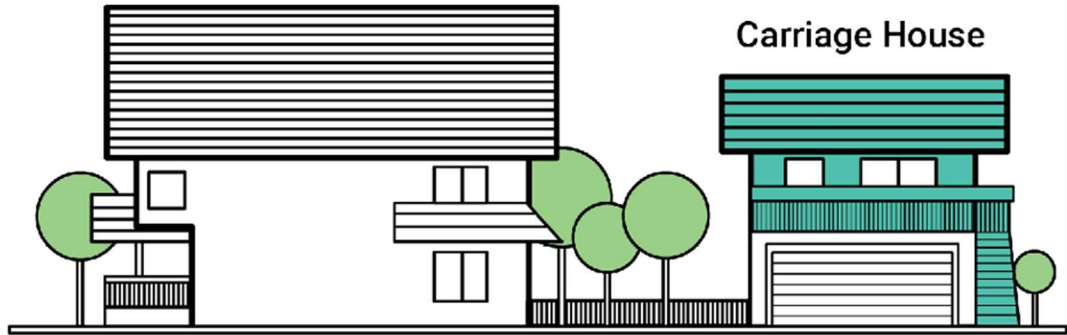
For example, a Single-Detached Dwelling and a Carriage House is permitted on a lot 4 ha or greater. Strata titling of the Carriage House is not permitted.
